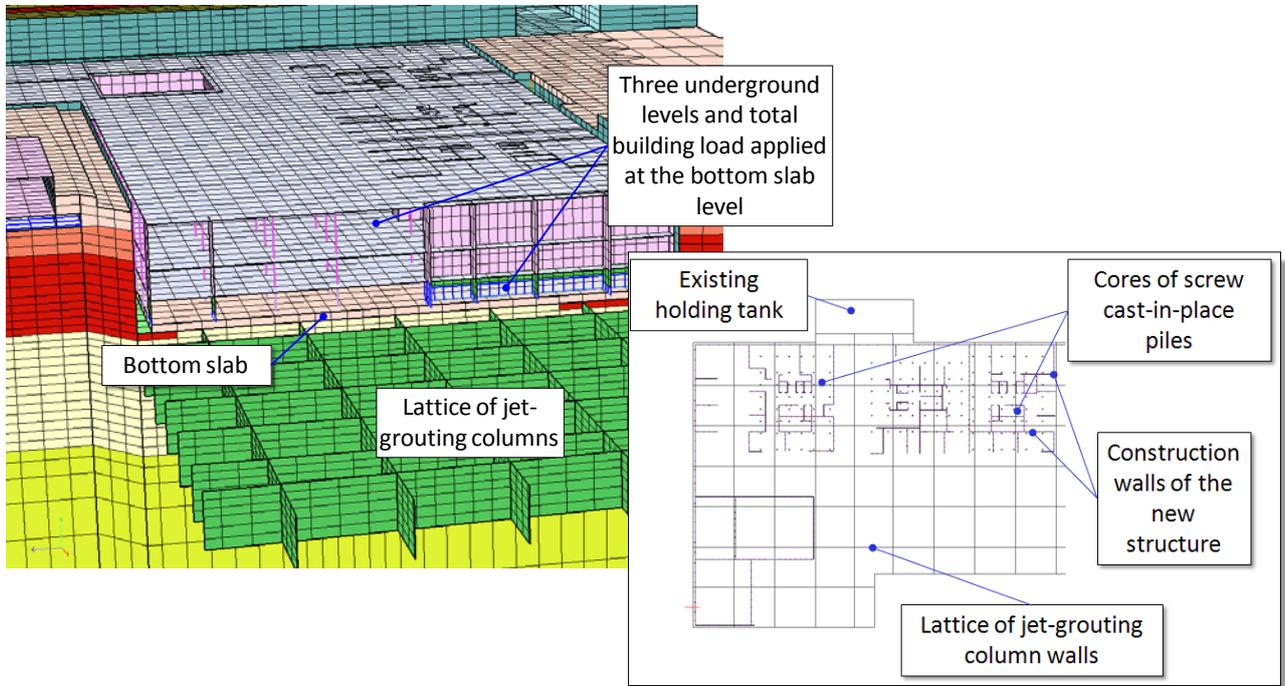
Modeling of the above-ground structure and piles for supporting vertical loads.
